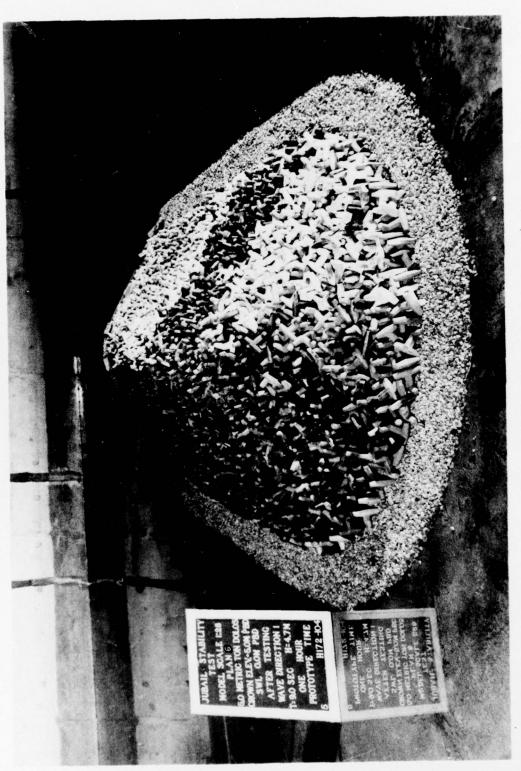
End view of Plan 6 after attack of 9-sec, 4.7-m waves from wave direction 1
